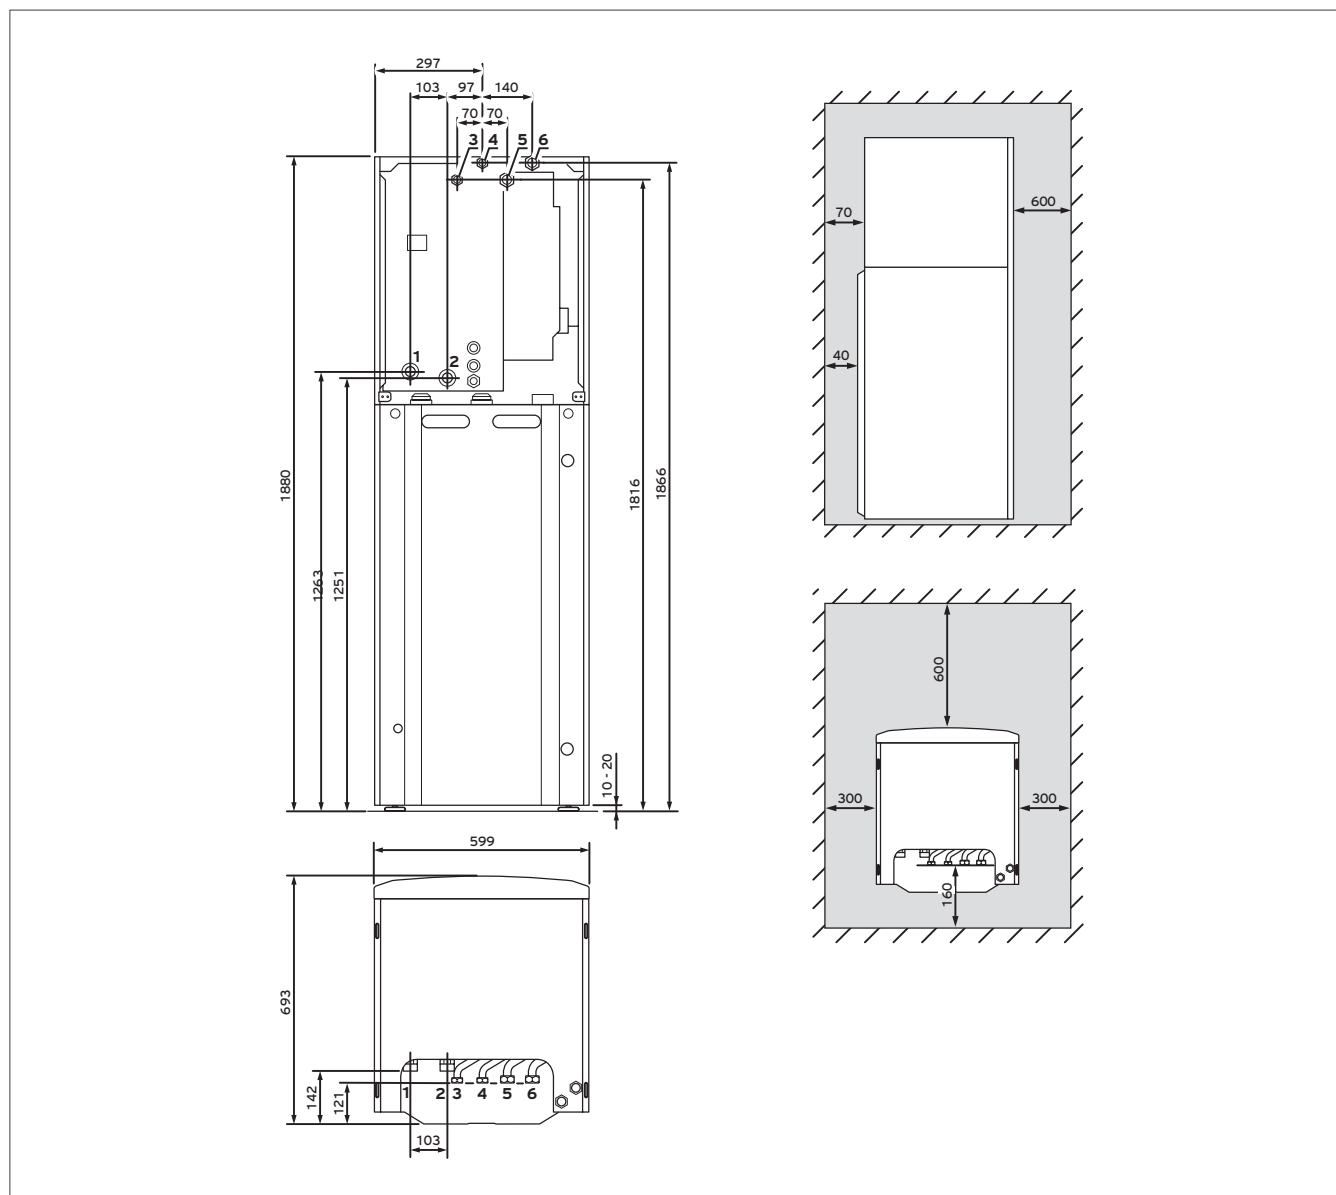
unitTOWER VIH QW 190/1 E dimension drawing and connection dimensions
